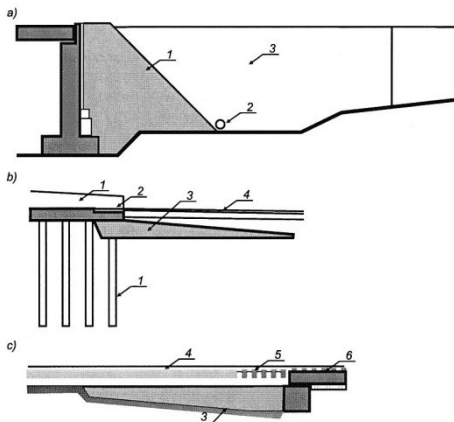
Diagrams of transition track sections, laid between the bridge and the pavement on the railway route [17, 18]: a) 1 - earth embankment stabilized with cement mortar, 2 - drainage line, 3 - earth embankment; b) 1 - bridge structure, 2 - elastic layer, 3 - concrete slab or a layer of soil stabilized with cement, 4 - ballastless track surface, c) 3 - concrete slab or soil stabilized with cement layer, 4 - ballastless track surface, 5 - pavement with ballast layer, 6 - ballast pavement on the bridge structure.
